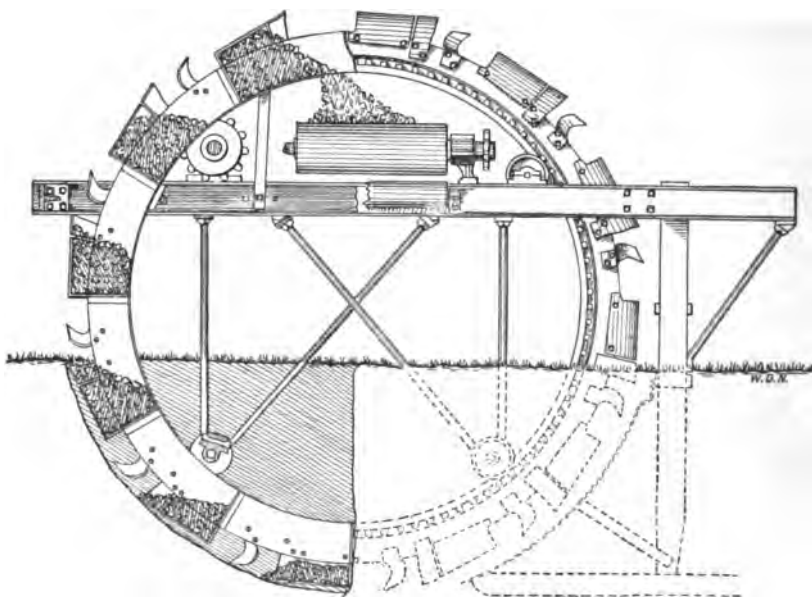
Digging mechanism of a common type of wheel excavator.
